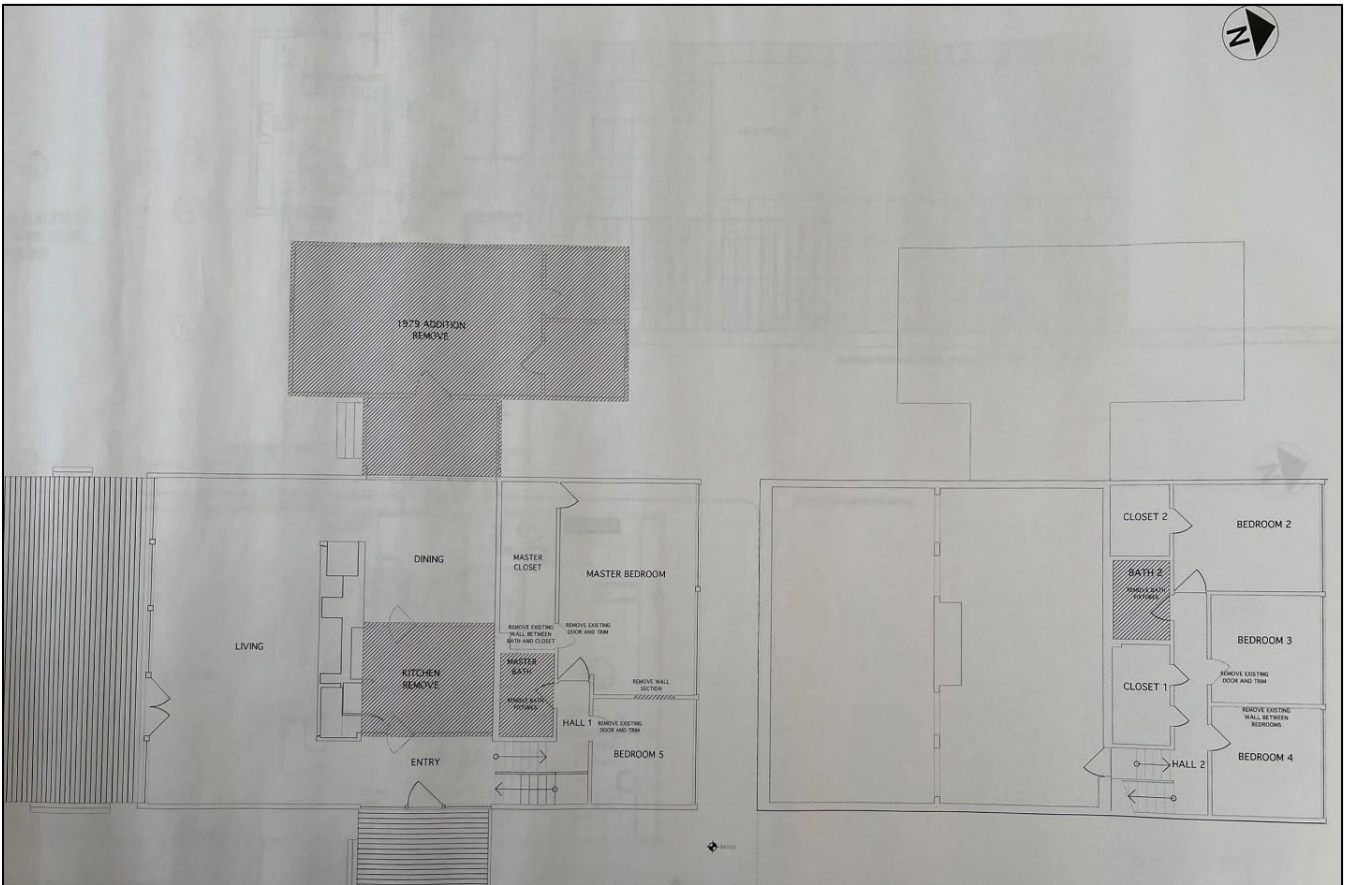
Plans showing the Smullen House, 160 Chichester Road, prior to the 2011 renovations and addition (provided by Edward Bases).
